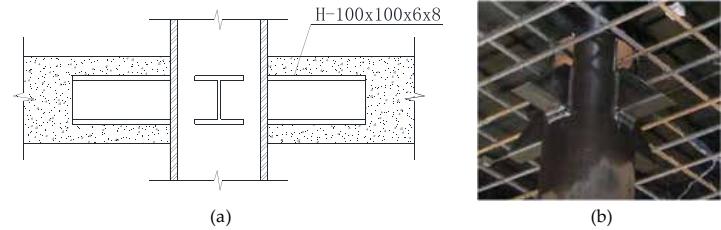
Shearhead configurations; a) Steel I shearhead sections welded on steel tubular column outer surface for reinforced concrete flat plate connection([Lee et al., 2008](#)); b) Shearhead inserted into steel tube column slots([Yan and Wang, 2016](#)).
